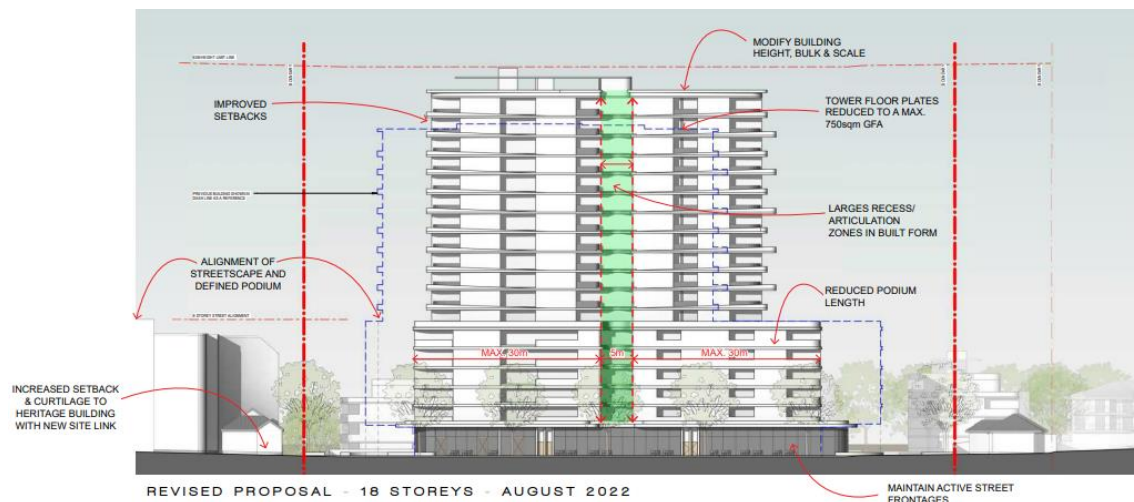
Old Northern Road elevation showing amendments from the previous version of the Planning Proposal (Source: Altis)
